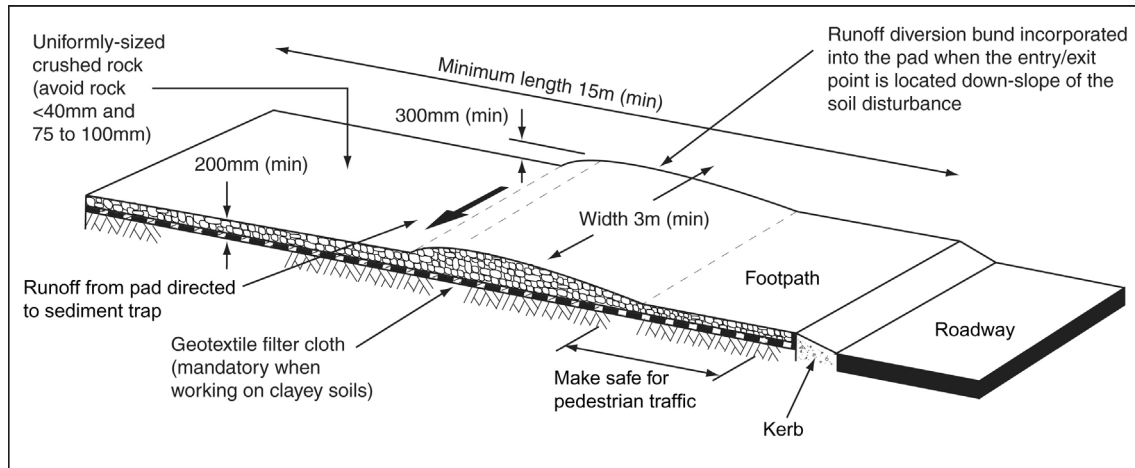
Example a *Construction Exit* that drains back into a site
